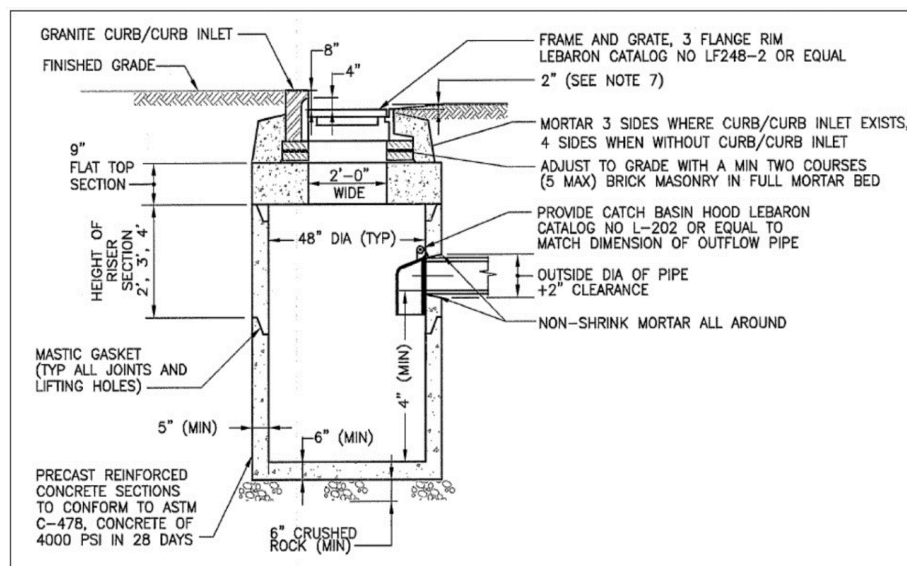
Stormwater sump detail (Commonwealth of Massachusetts, 2008)
